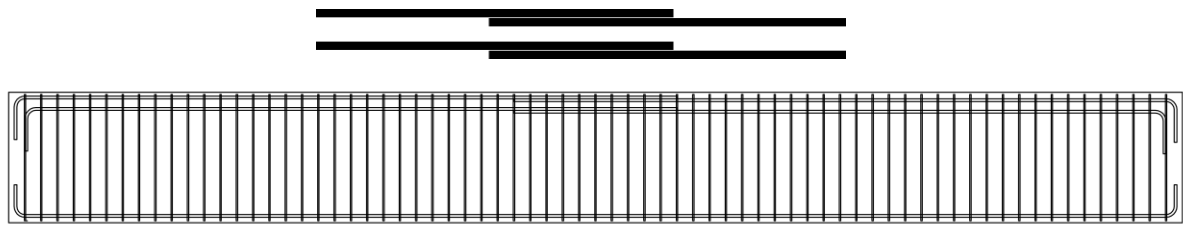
Lap Splice Configuration B and Typical Beam elevation.
